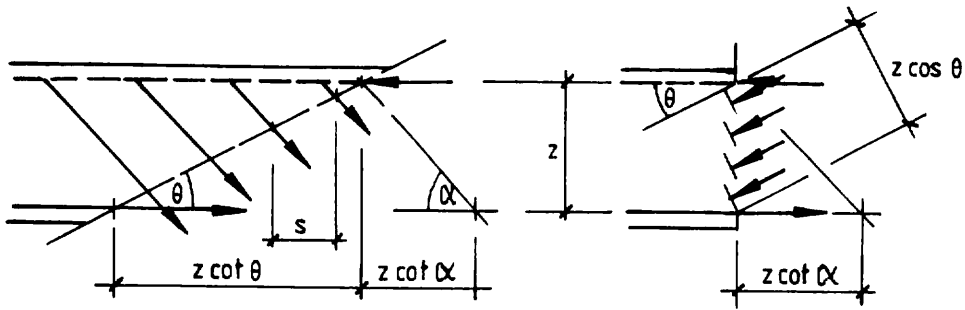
Equilibrium conditions in a truss model of a beam with inclined stirrups
